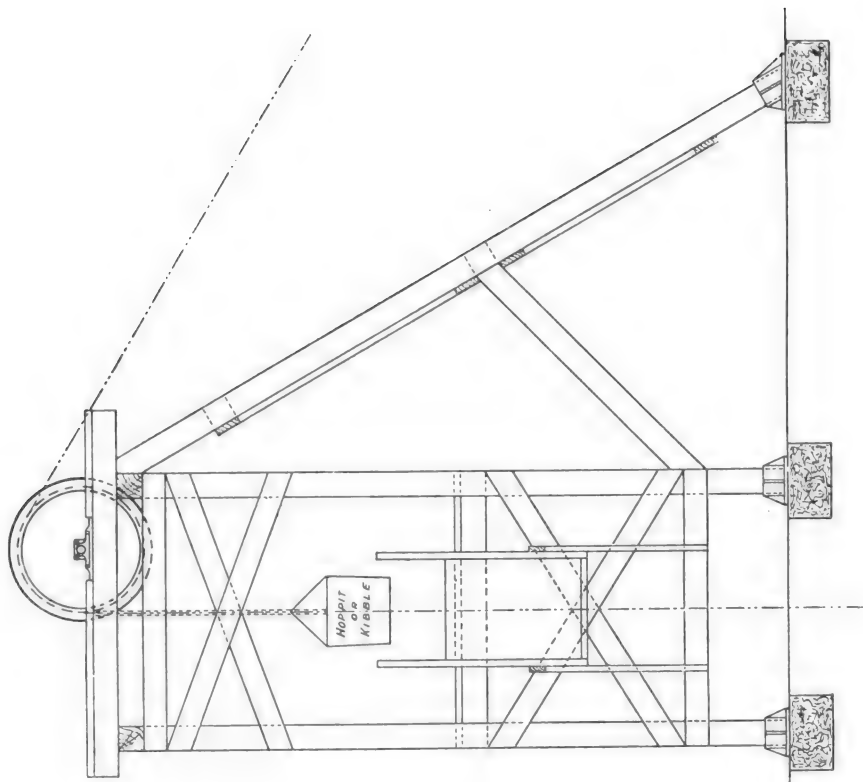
Wooden Headgear for use at a Sinking Pit.
